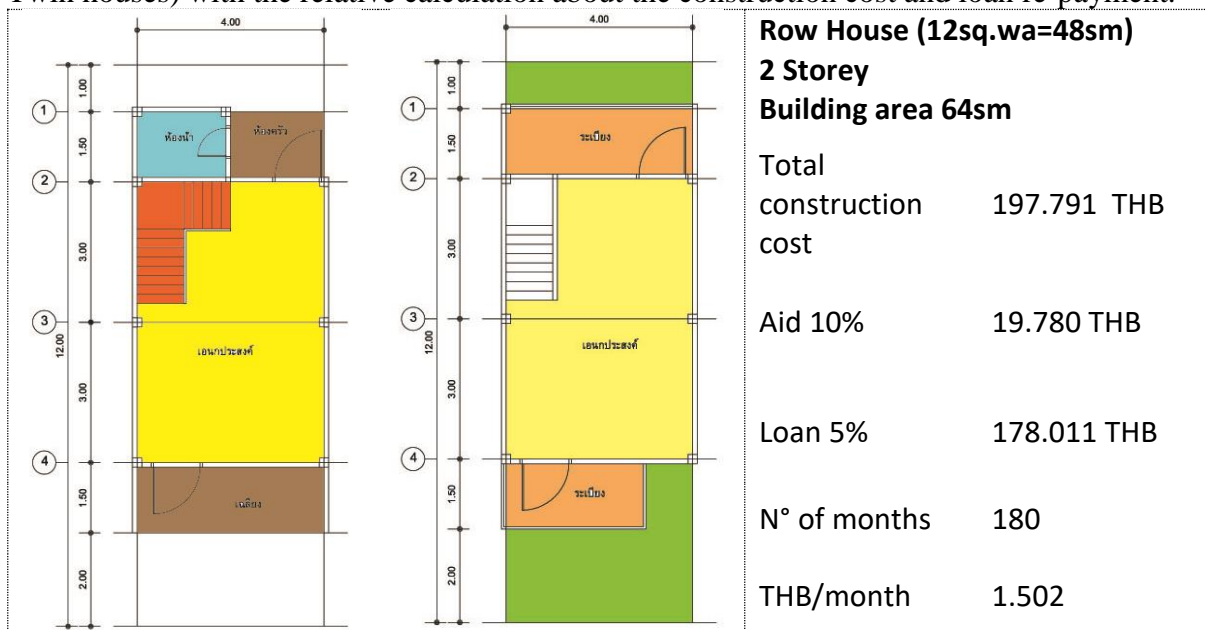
Plan of the two storey Row House (1st floor on the left, second floor on the right)
